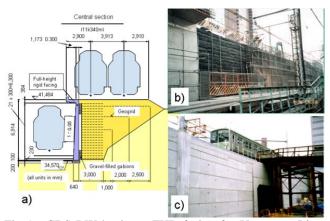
GRS RW having a FHR facing for Yamanote Line (one of the busiest urban railways in Japan) flying over Chuo Line (another busiest urban railway) in Tokyo (constructed during 1995–2000): a) typical cross-section; b) wall under construction; and c) completed wall.
